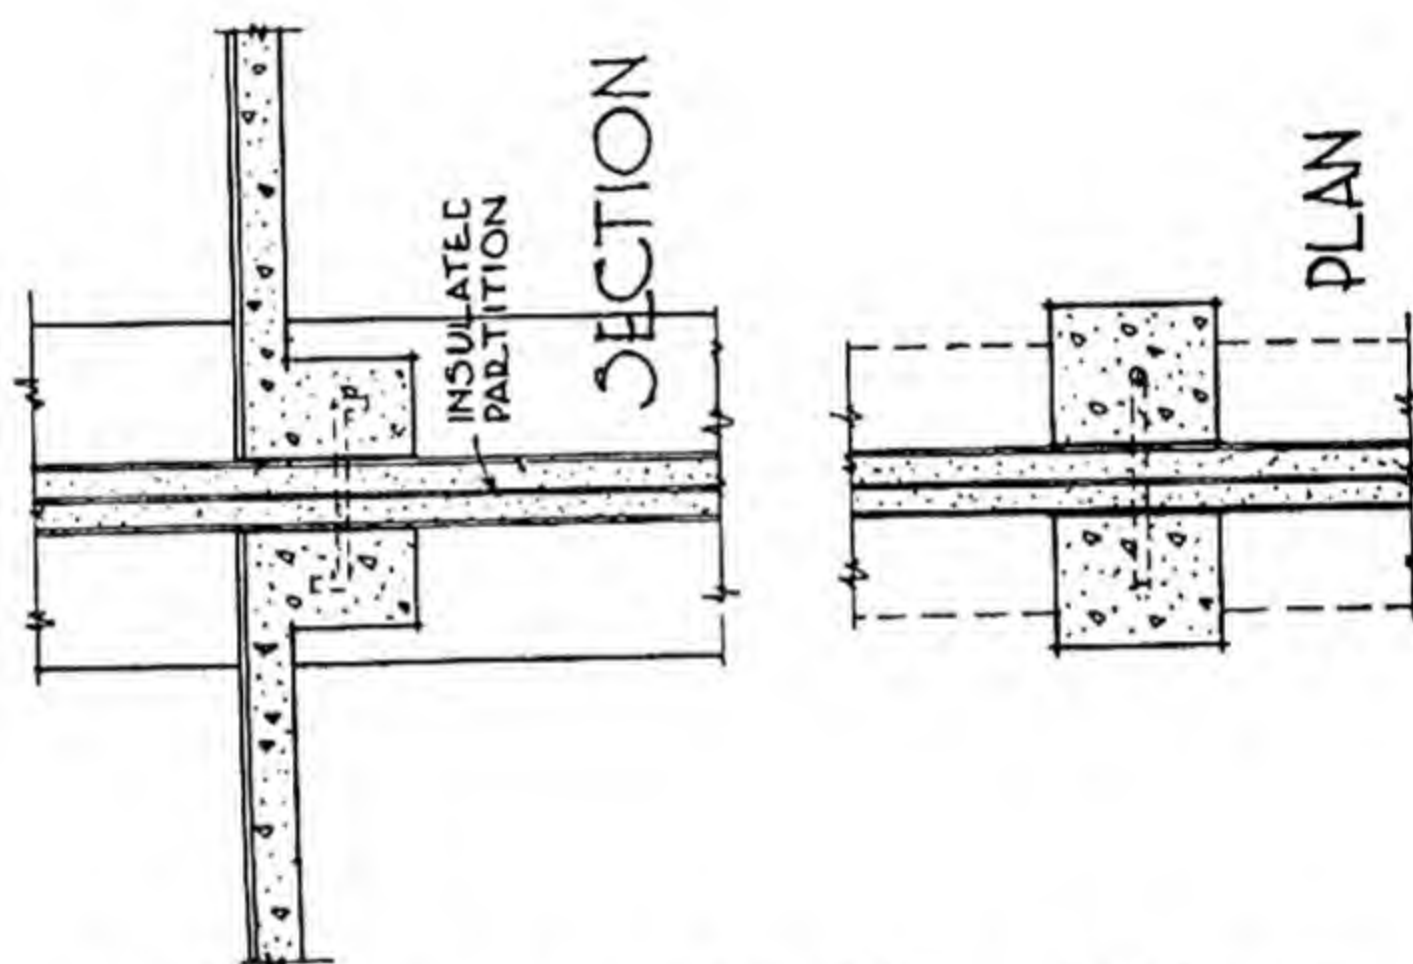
Construction of Split Column and Girder with Insulated Partition.
